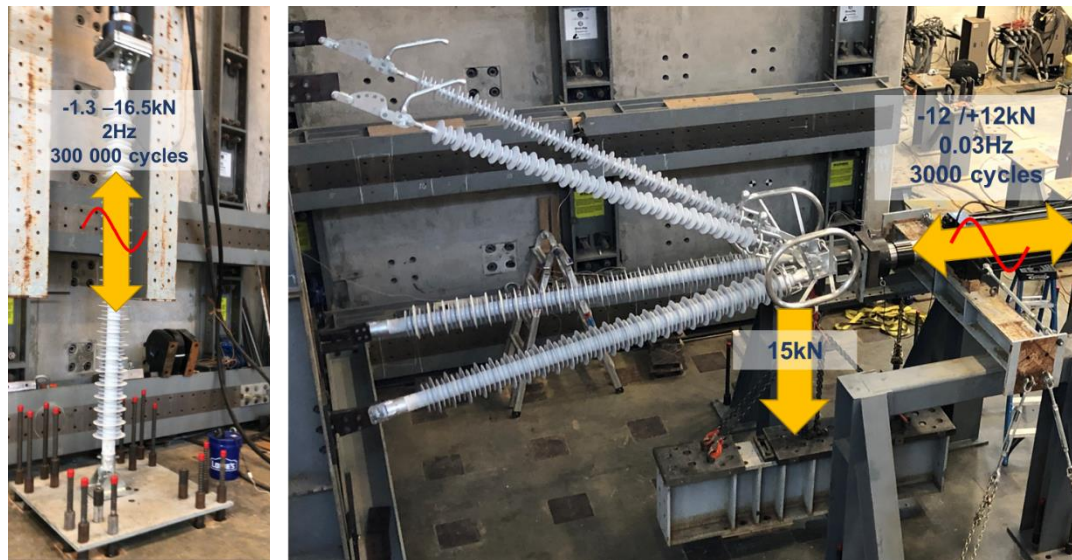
Test set-ups for cyclic loading test of post insulator and full cross-arm assembly.
